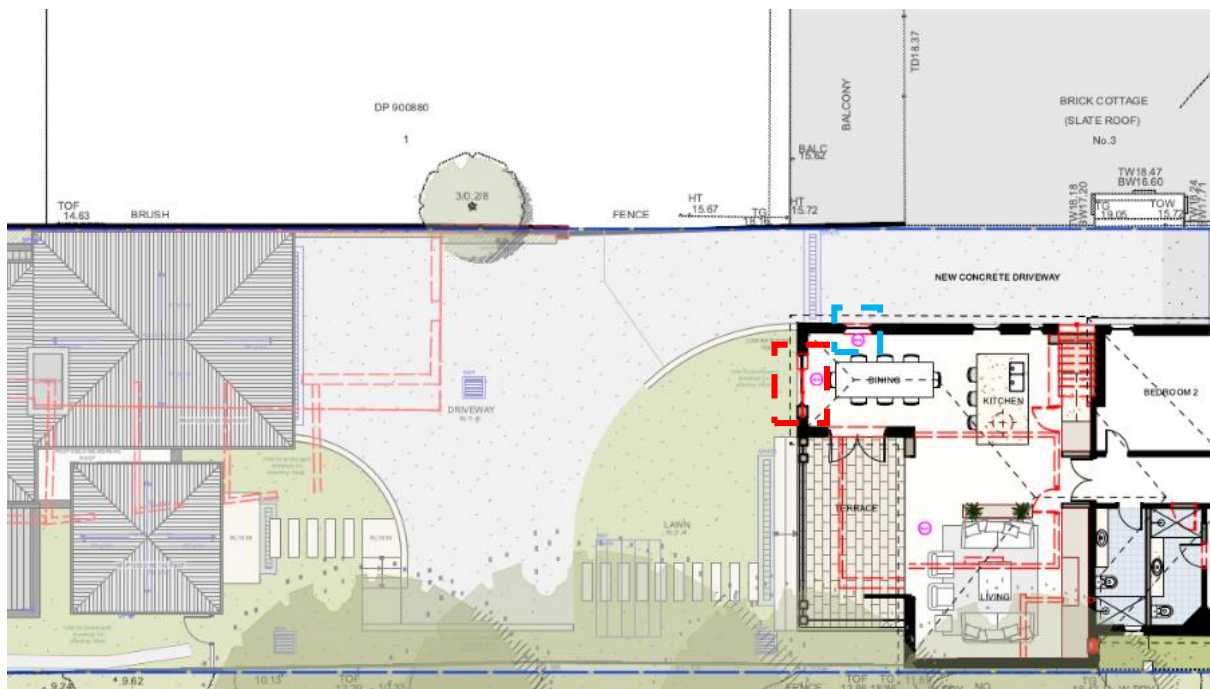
First floor plan of Dwelling 1 in relation to neighbour to east (W03 shown in blue dash, W04 shown in red dash)
